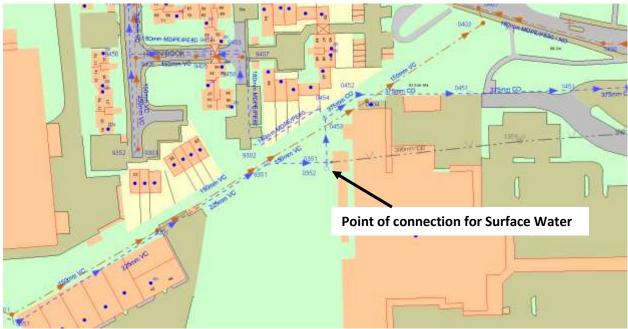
Showing your proposed surface water point of connection at manhole 0352 with a Cover Level of 73.371m and an Invert Level of 71.379m.
